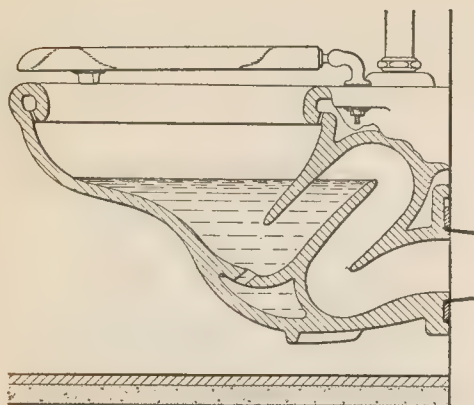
,578.—Mott, Suspendo, syphon jet wall hanging water closet with extended front lip and non-soil flushing rim.
